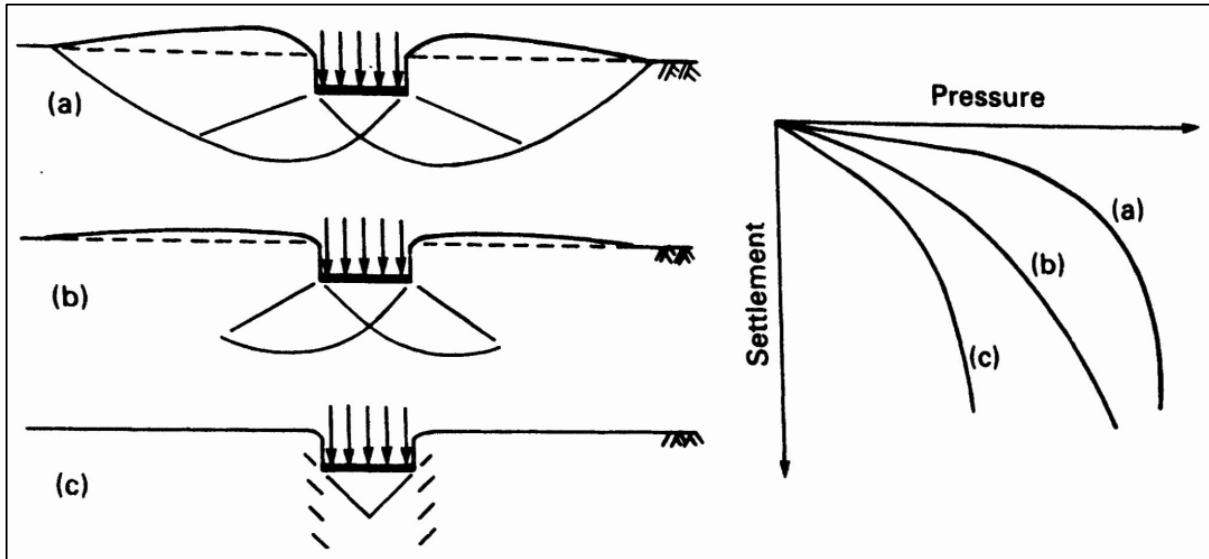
Failure mechanism of foundations (Craig, 2004)
